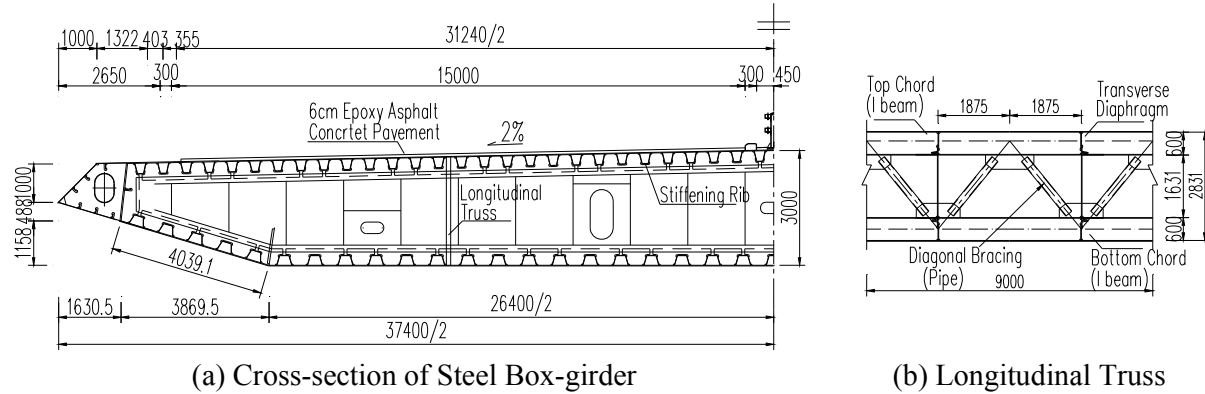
Box-girder of the RCB and Its Longitudinal Truss (dimension unit in mm)
